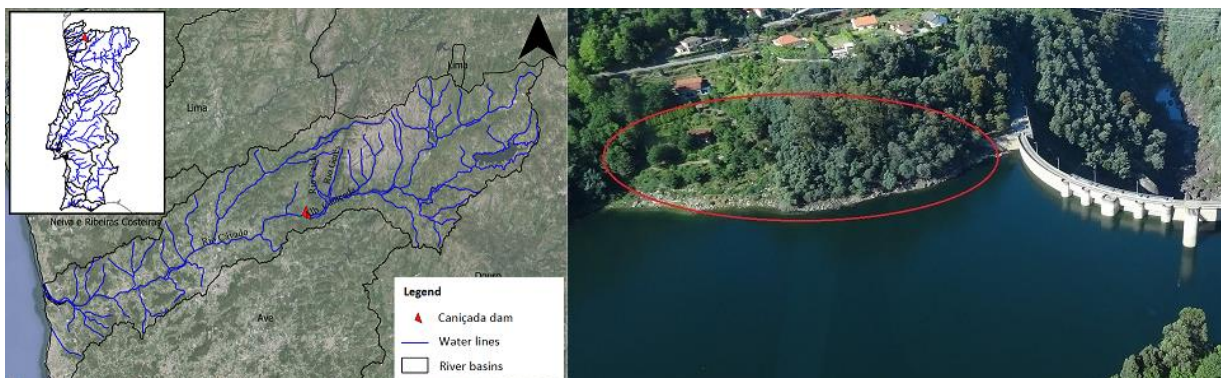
Location and delimitation of the complementary spillway construction work site.
